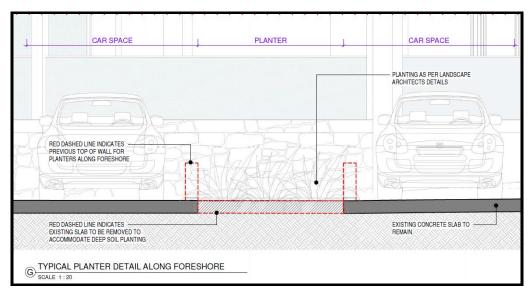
Previous Planter detail (Source: Innovate, Revision C)
